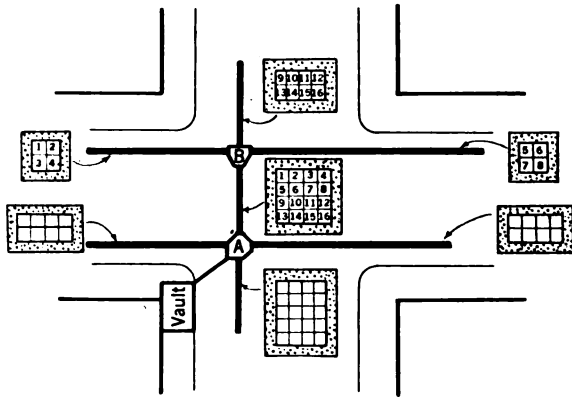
ARRANGEMENT OF CONDUIT AND MANHOLES AT STREET INTERSECTION
